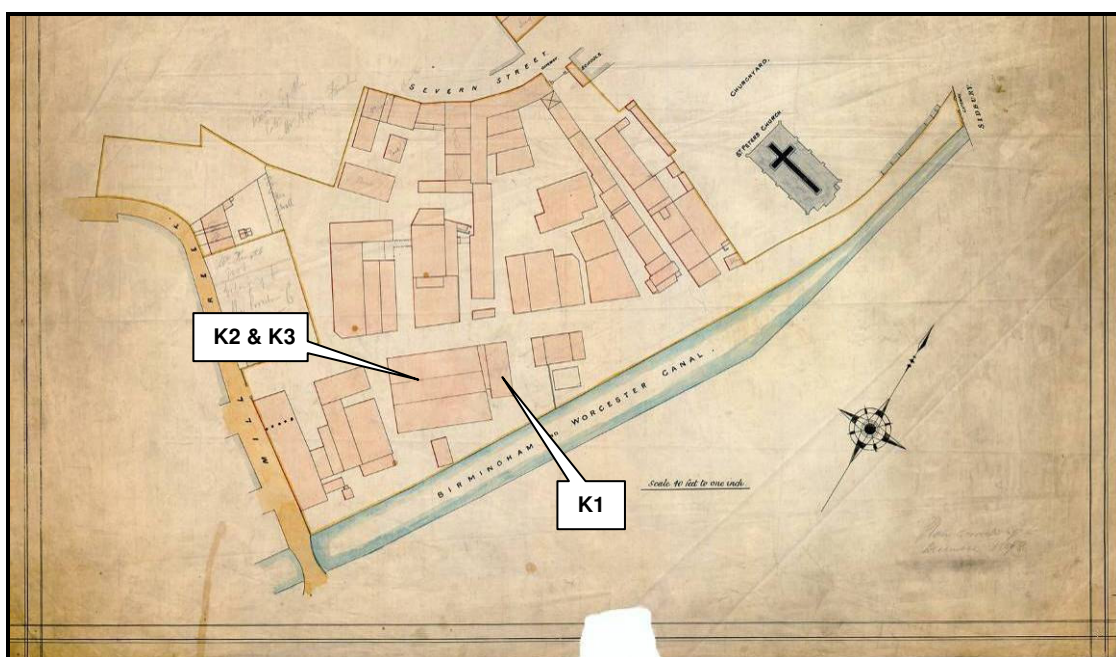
Plan of the Works in 1898 showing the Binns Buildings with K1 on the north (WPM)
